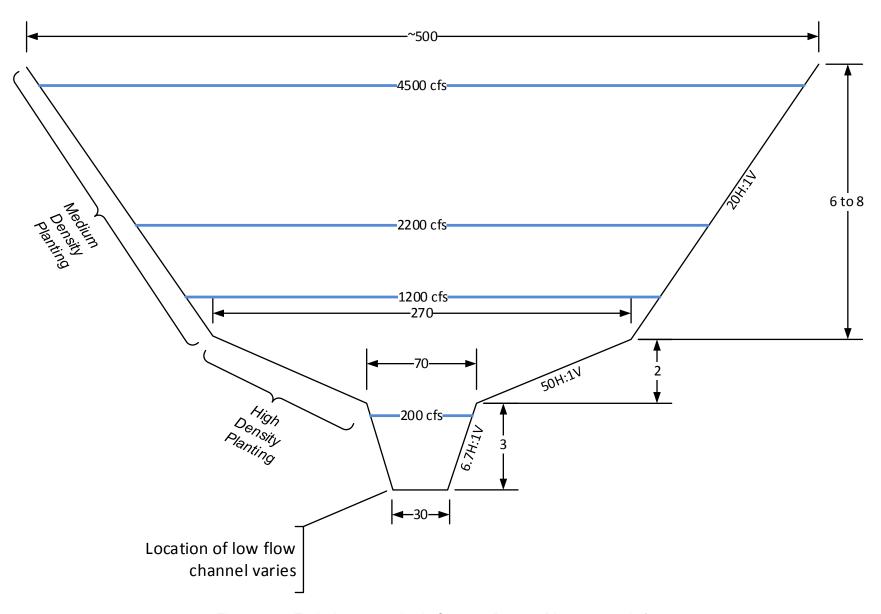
Typical cross section in Compact Bypass. Distances are in feet.
